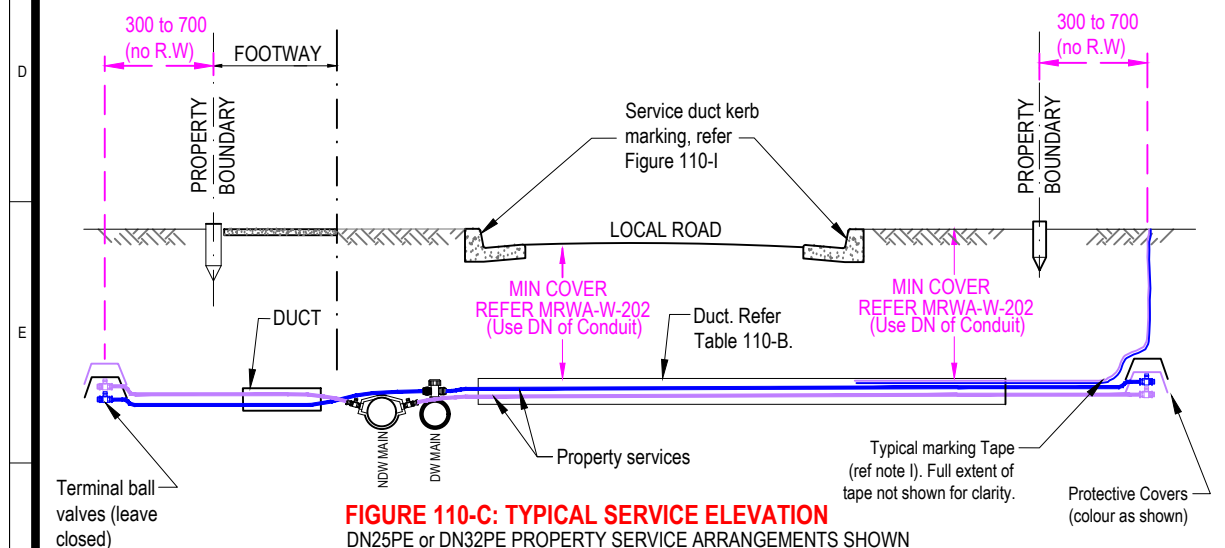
C: TYPICAL SERVICE ELEVATION
